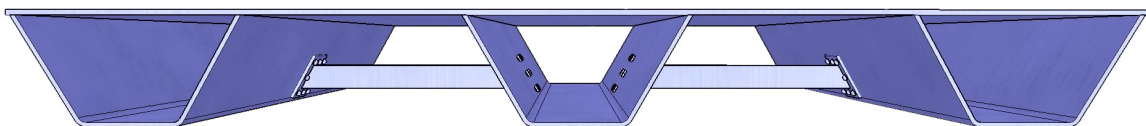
Connecting the vertical plates to the stiffeners with blind bolts
